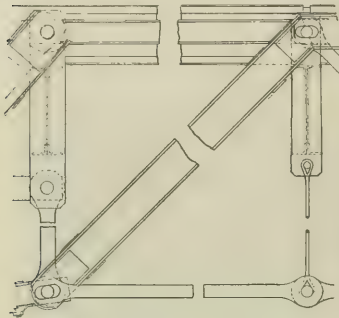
PANEL WHERE CONNECTING GIRDER JOINS CANTILEVER SPAN, FRASER RIVER BRIDGE, SHOWING OBLONG PIN HOLES FOR EXPANSION.
